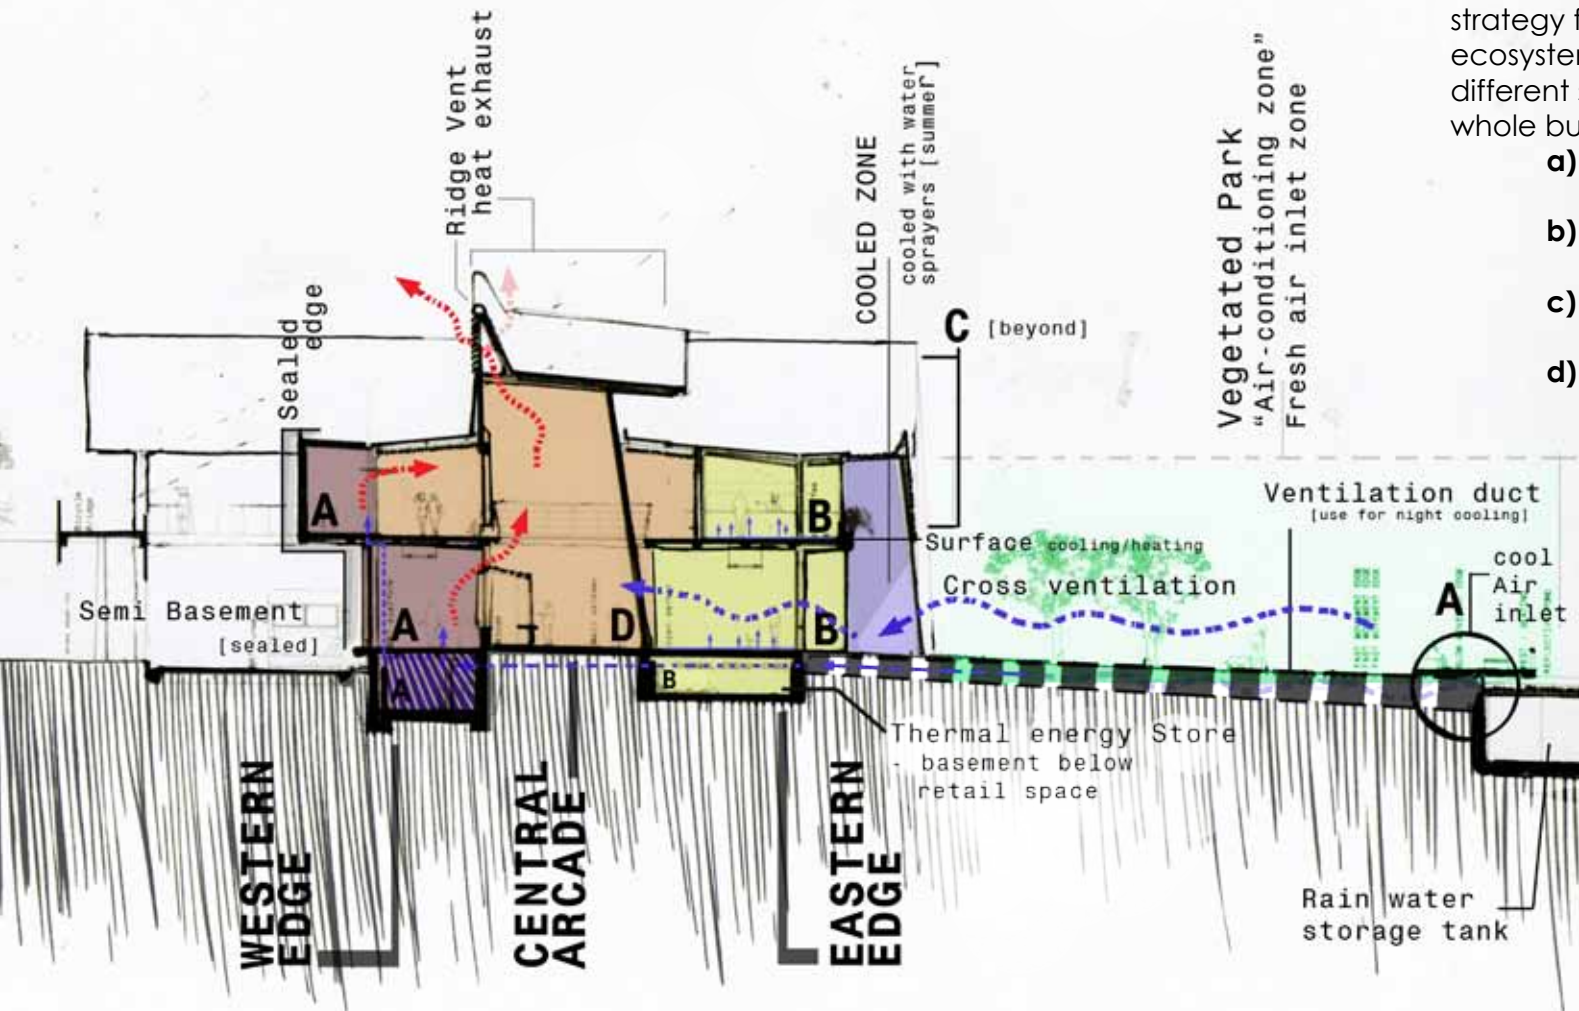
Ventilation systems and zoning within the building [Source: Author]
